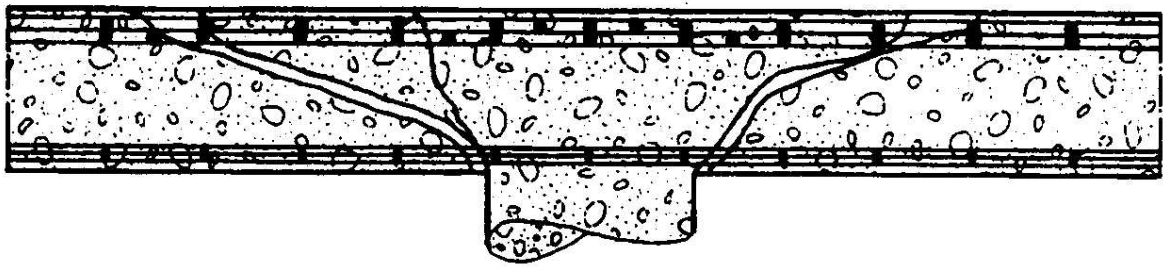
Typical shear failure near column. Proper detailing of shear reinforcement must be provided
